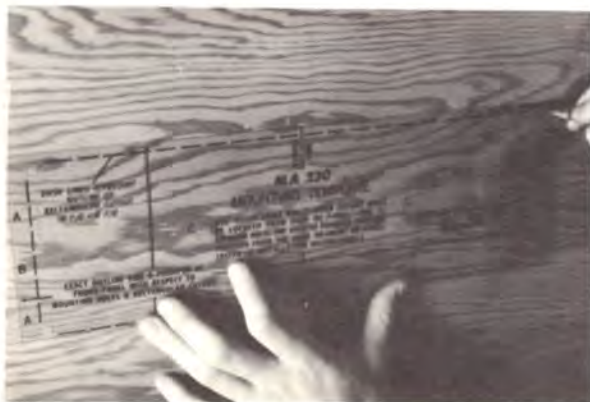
Positioning the Mounting Template over proposed area to be cutout.
